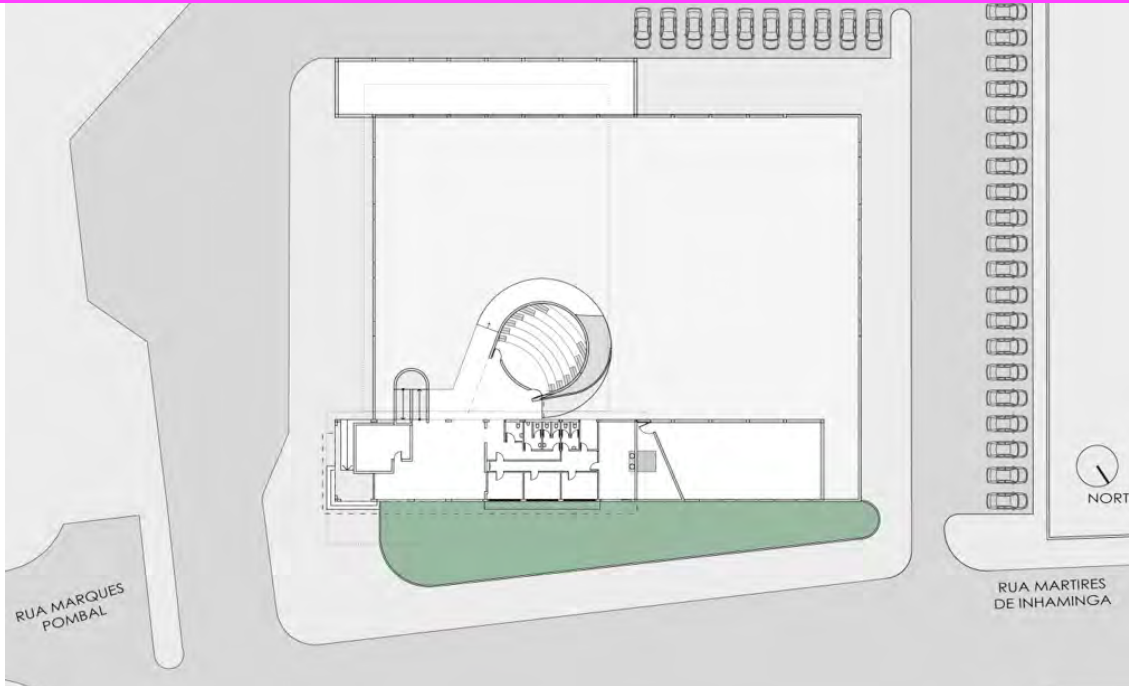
Floor plan (José Forjaz Arquitectos, 2008: Online)
